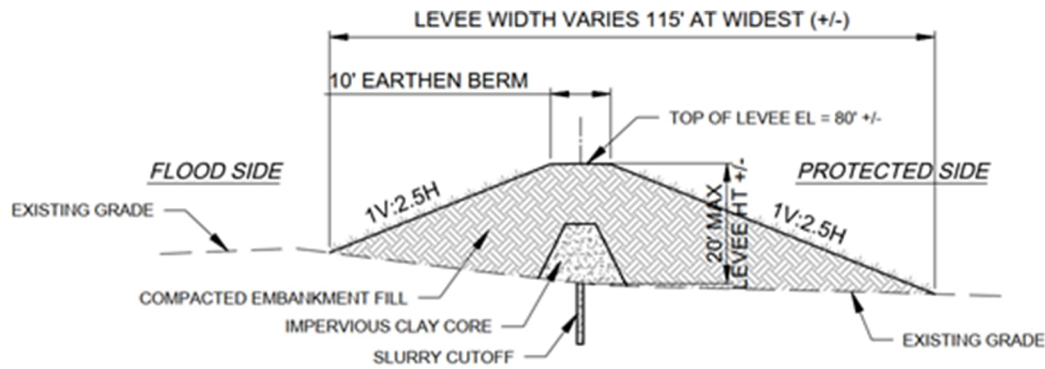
Sample Cross-Section of Levee Flood Protection at Back Loop
